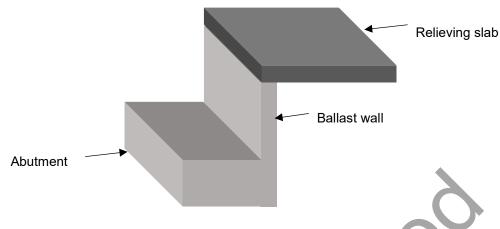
(b) - As Constructed Survey of relieving slabs
